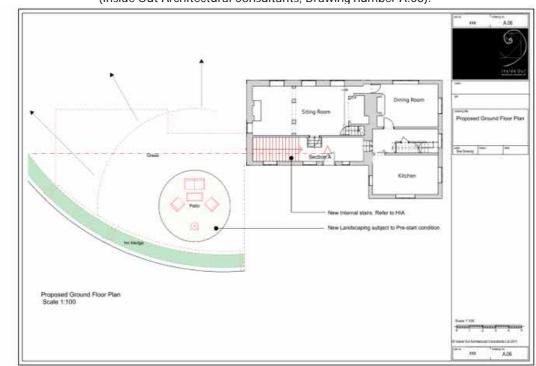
Proposed ground floor plan (Inside Out Architectural Consultants, Drawing number A.06).
